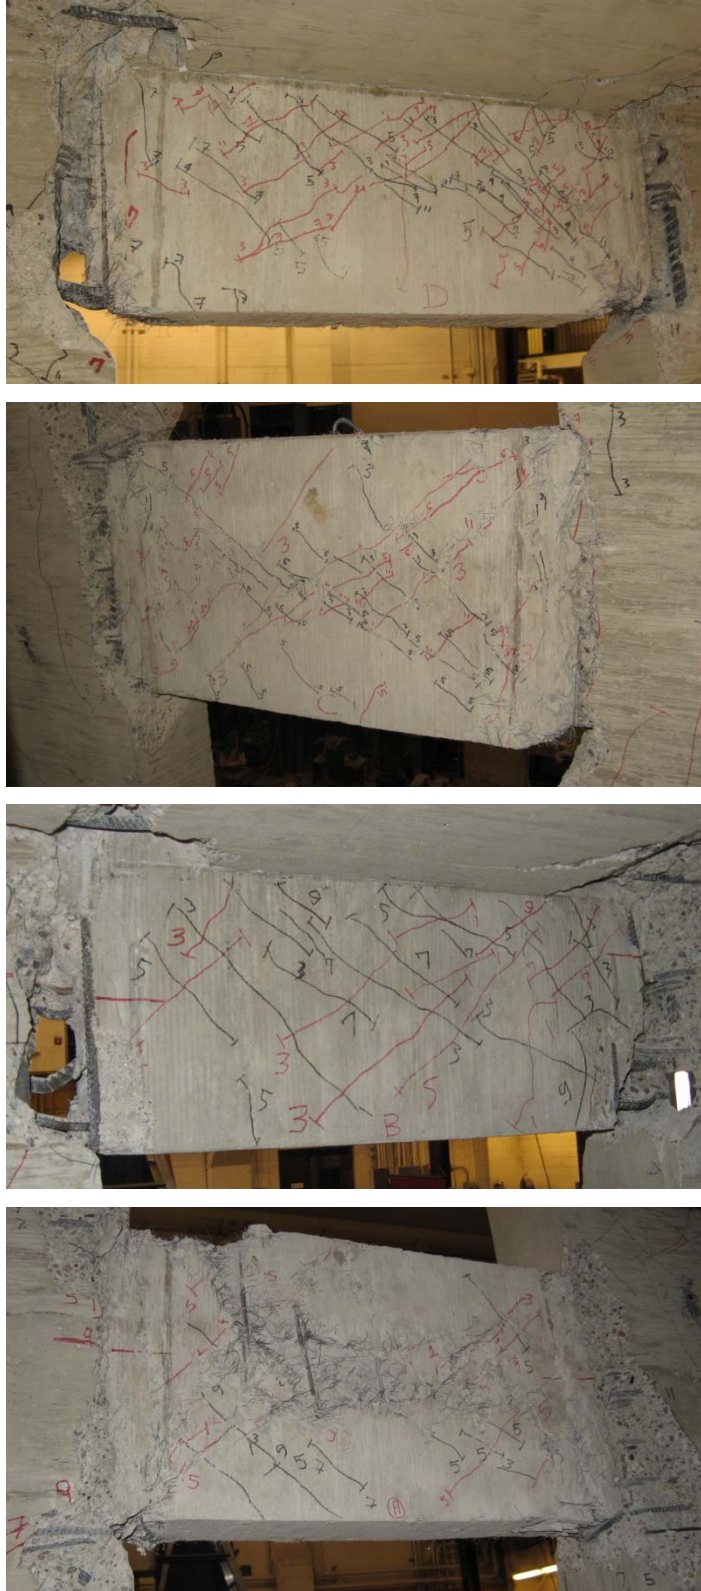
Damage state of coupling beams in Specimen CW-1 after testing. Coupling beams from story level four down to one are shown from top to bottom, respectively.
